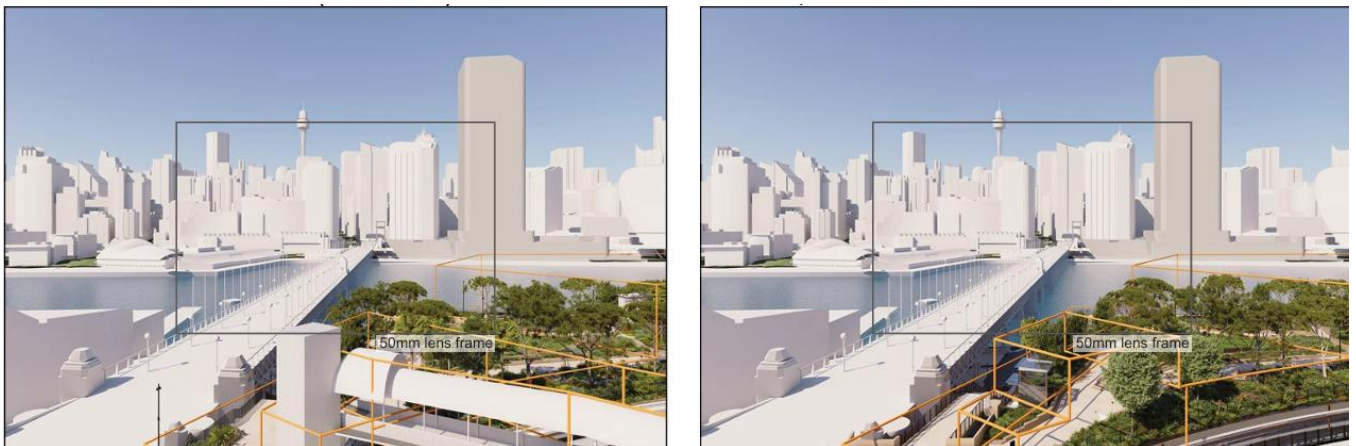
Apartment 202, looking north-east (low-rise, southern) – as approved (left) and as amended (right)
